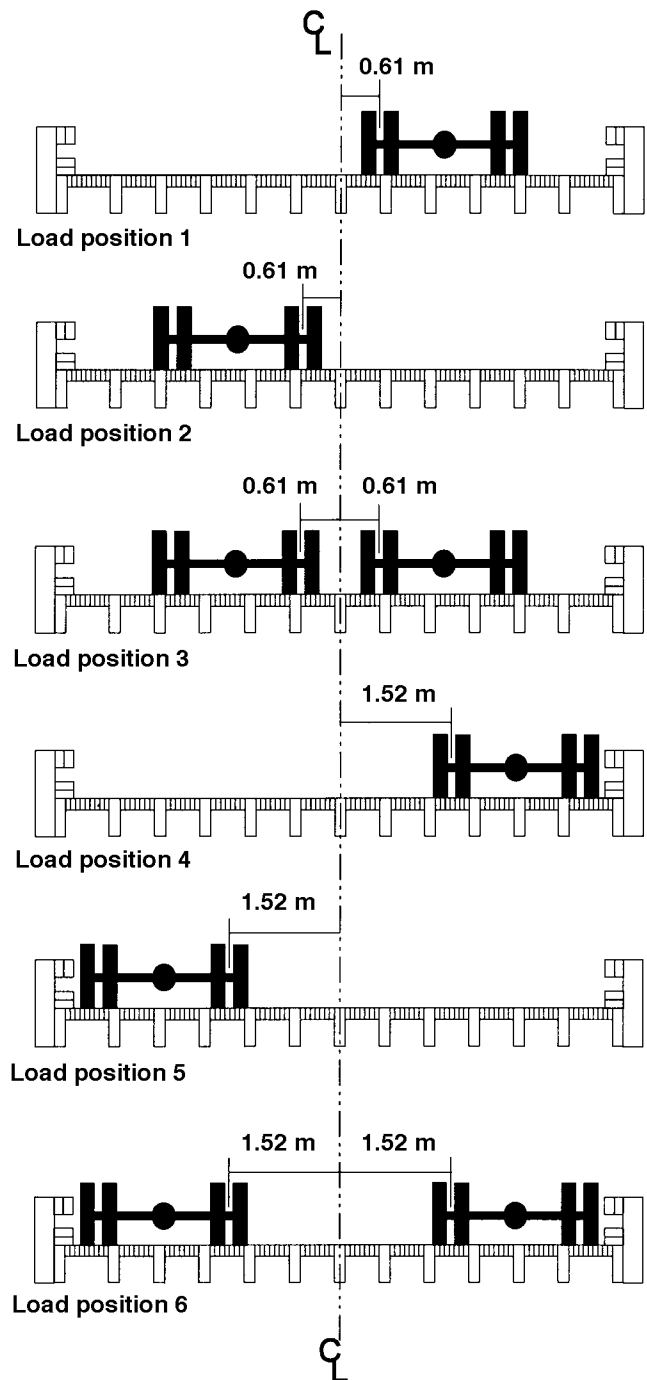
Transverse load positions (looking north) used for all static load tests on the North Siwell Road bridge.
